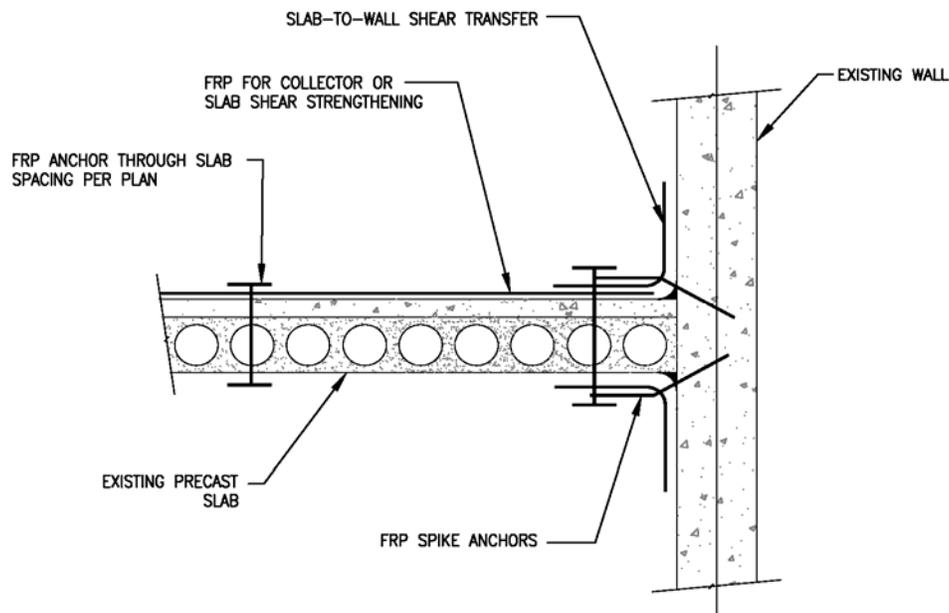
Section at slab-wall intersection showing FRP spike and through anchors
